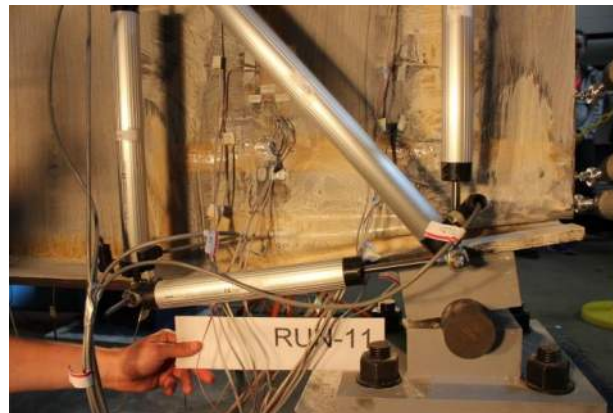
Damaged Girder Bearing: +1.50 in
